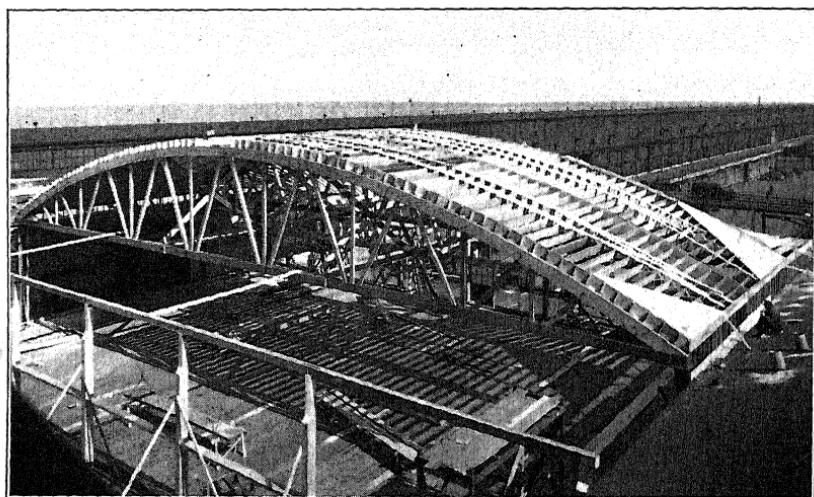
111-ft. bowstring trusses designed and built by McKeown Bros., Chicago, Ill.; $2\frac{1}{2}$ -in. split rings used between web members and chords, and 4-in. flange shear plates at heel joints.
